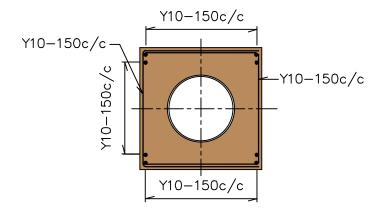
DETAILS OF CONCRETE BED & ENCASEMENT OF PIPE
